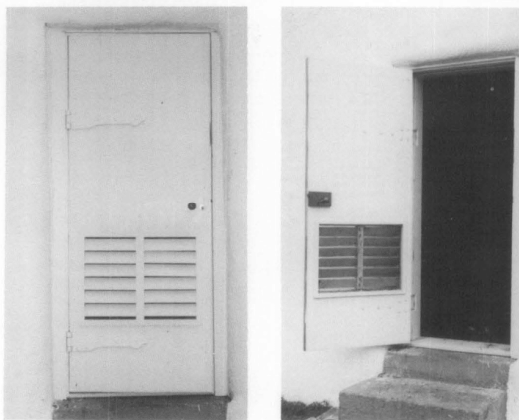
If historic doors would be damaged by adding extra locks, they should be removed and stored and new security doors added. At this lighthouse, the historic door has been replaced with a new door (seen both inside and outside) with an inset vent and new deadbolt locks. The heavy historic hinges have not been damaged. Photo: Williamsport Preservation Training Center, NPS.
